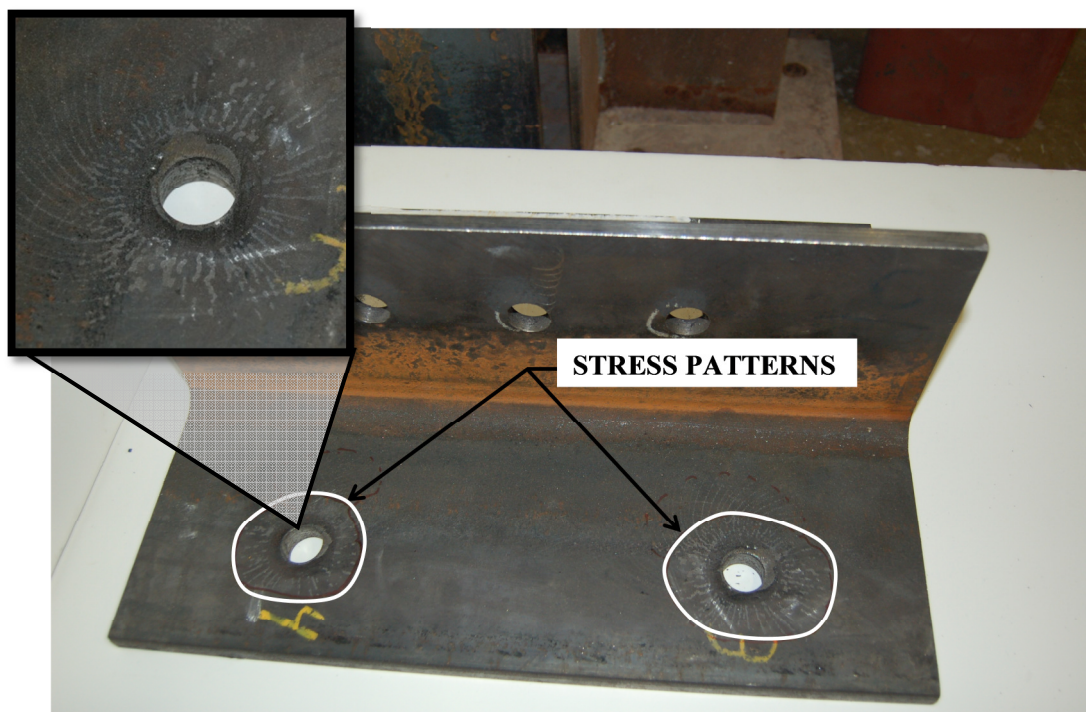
Stress Patterns for Specimen 2.5b.
